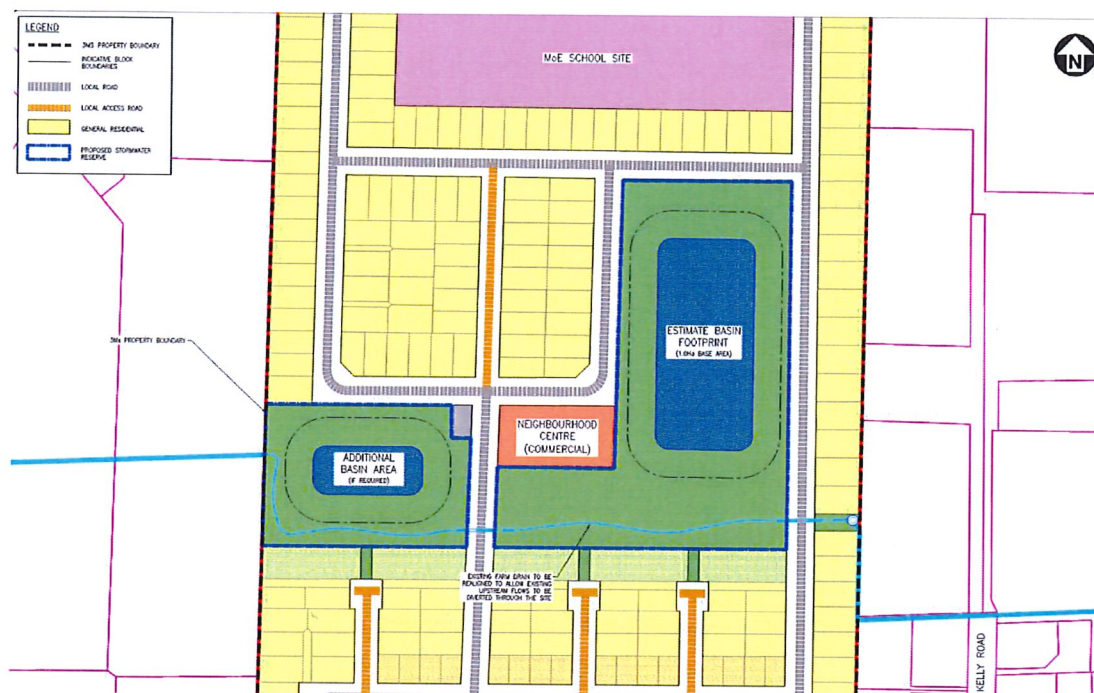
Alternative Stormwater Solution (General Arrangement)
